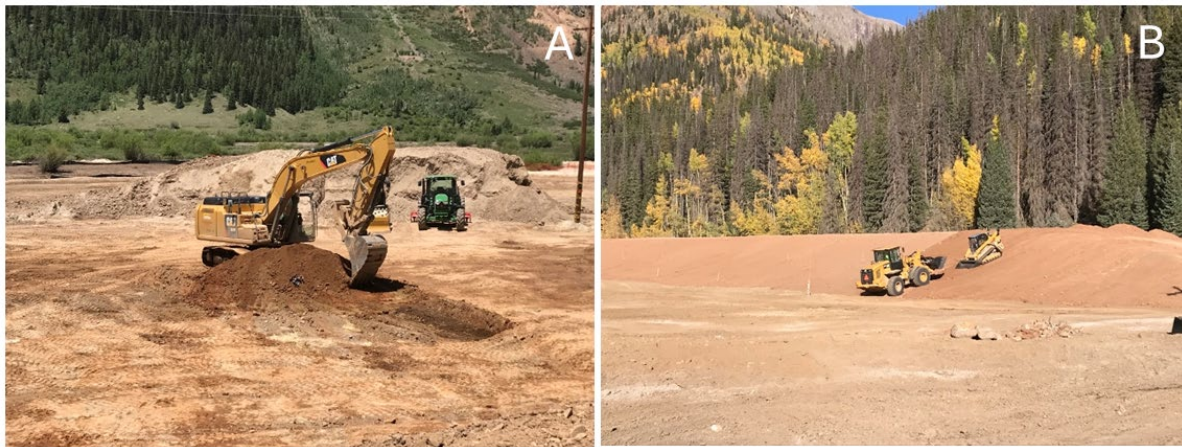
Kittimac tailings sludge and tailings mixing (A) and tailings berm construction (B).
